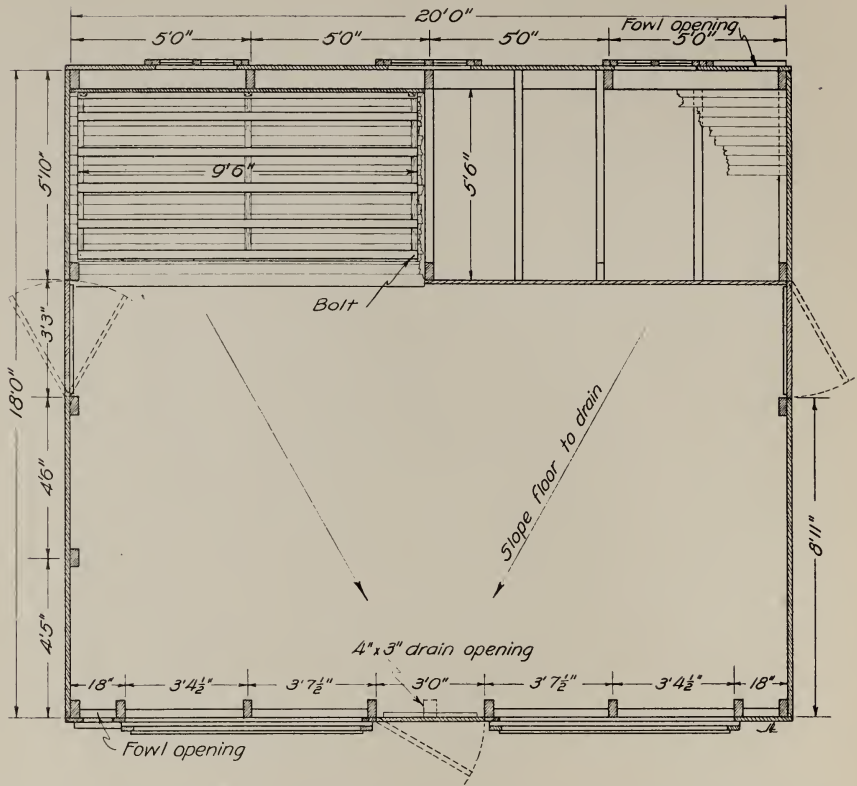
Floor plan of one 20-foot section of the commercial laying house. The floor drains from all sides to drain opening in front foundation wall. At left is shown the partition construction and at right the end wall construction. Only one section is shown as all the sections of any length of house would be alike. See text for discussion of floor and foundation.
